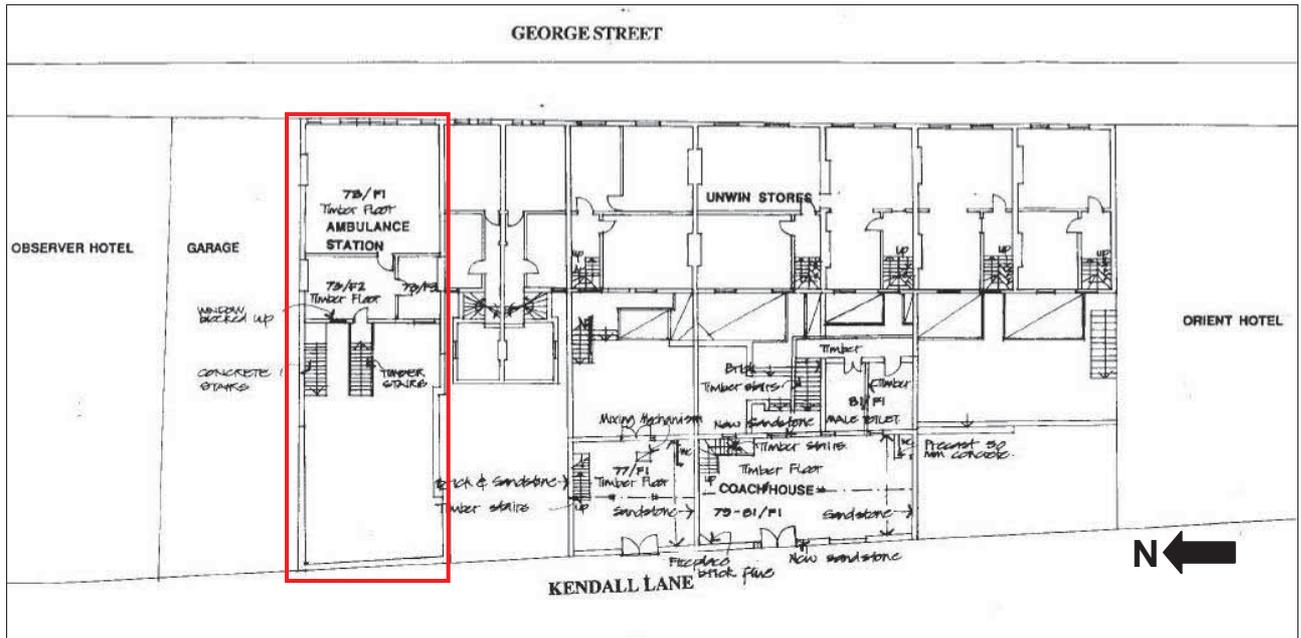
1989 drawing of the first floor of the buildings. The first floor of the then Ambulance Station is similar to the existing layout with the exception of stairwell insertion to the north of the front room and removal of the timber stair to the courtyard. The plan indicates timber floor to the rooms of the Ambulance Station.
